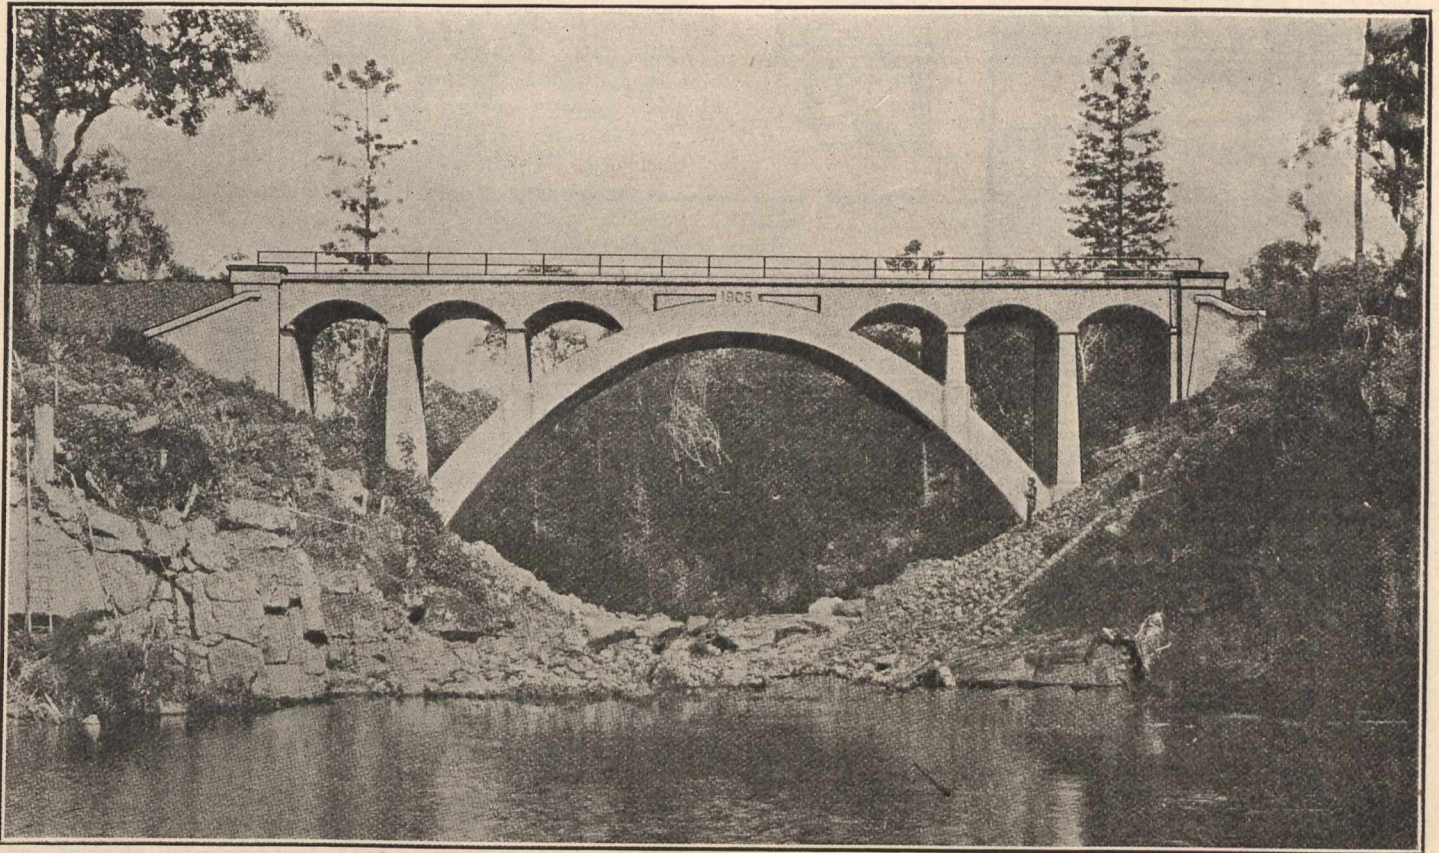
Modern Concrete Bridge: Queensland, Australasia.
